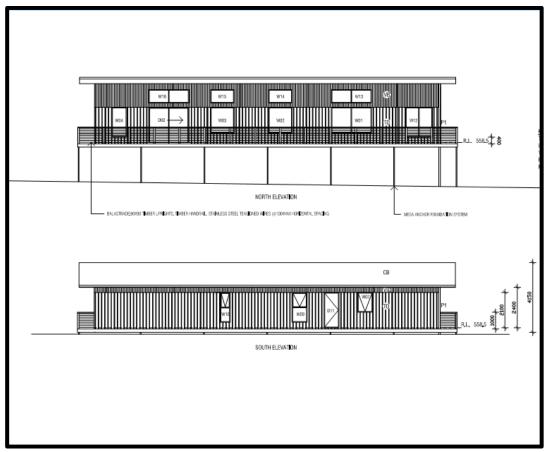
North and south elevations of proposed dwelling (Designful, 2017)
